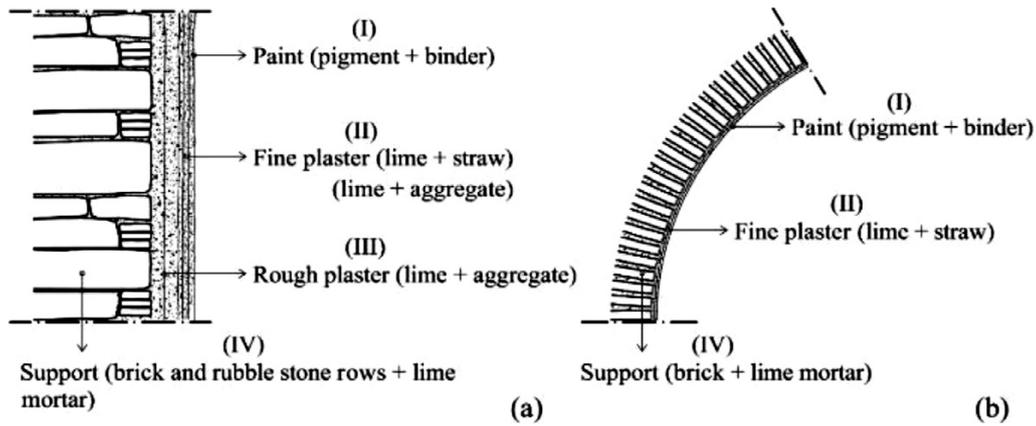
Schematic sections of the wall paintings: a) walls of the Başpınar Church, b) vault of the substructure of the Anaia Church
